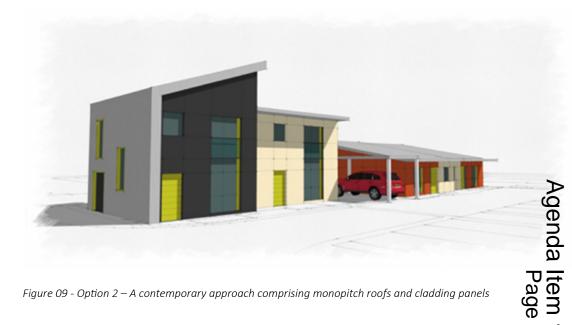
Option 2 - A contemporary approach comprising monopitch roofs and cladding panels
